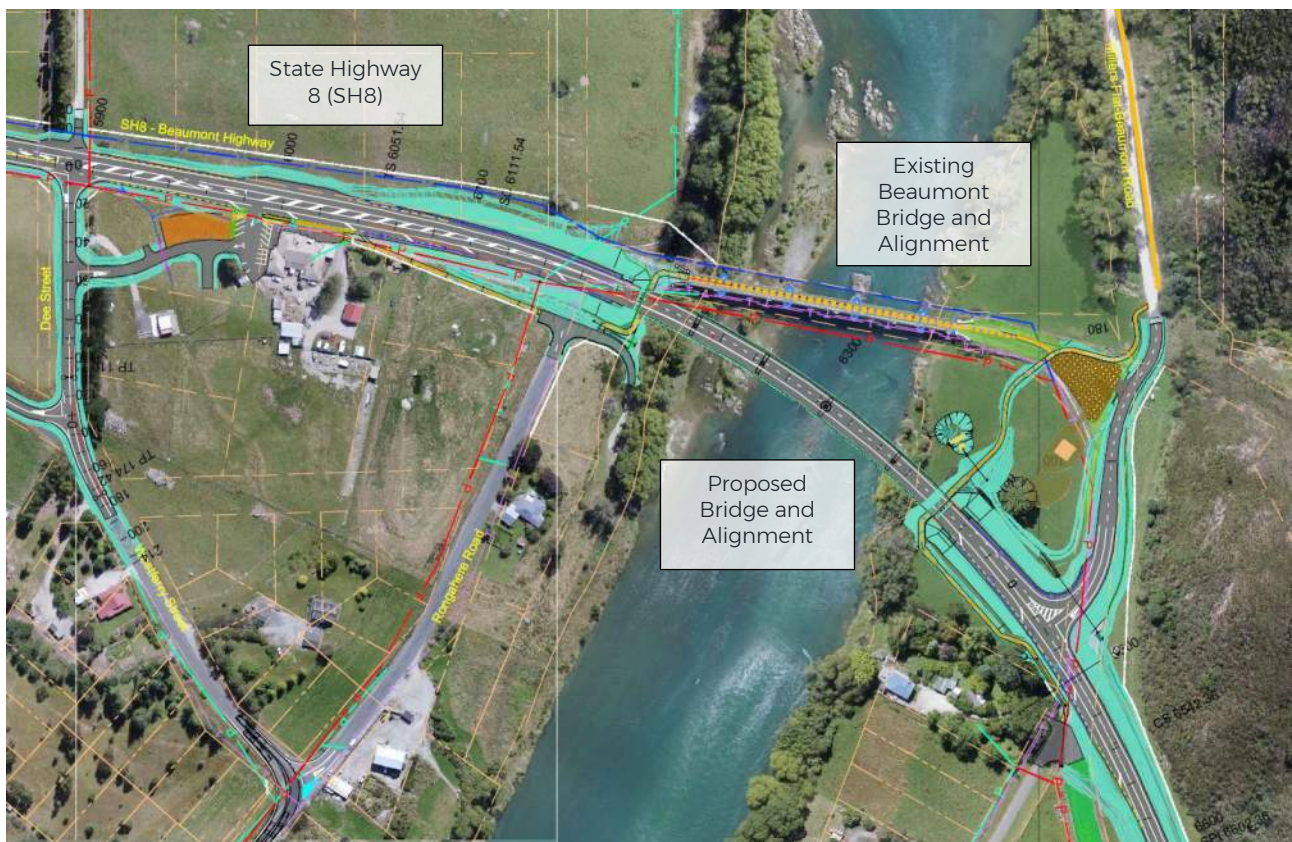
Existing and Proposed Alignments of the Beaumont Bridge
